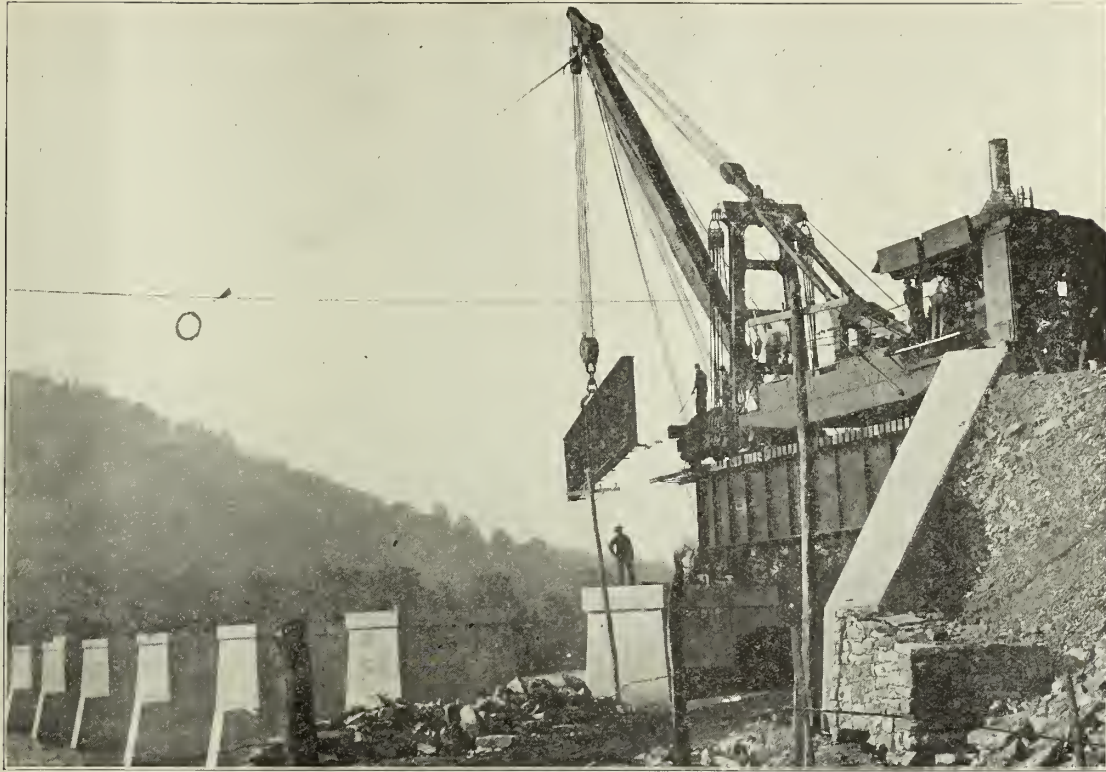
Traveler Placing Second Span, First Crossing of Youghiogheny River.
